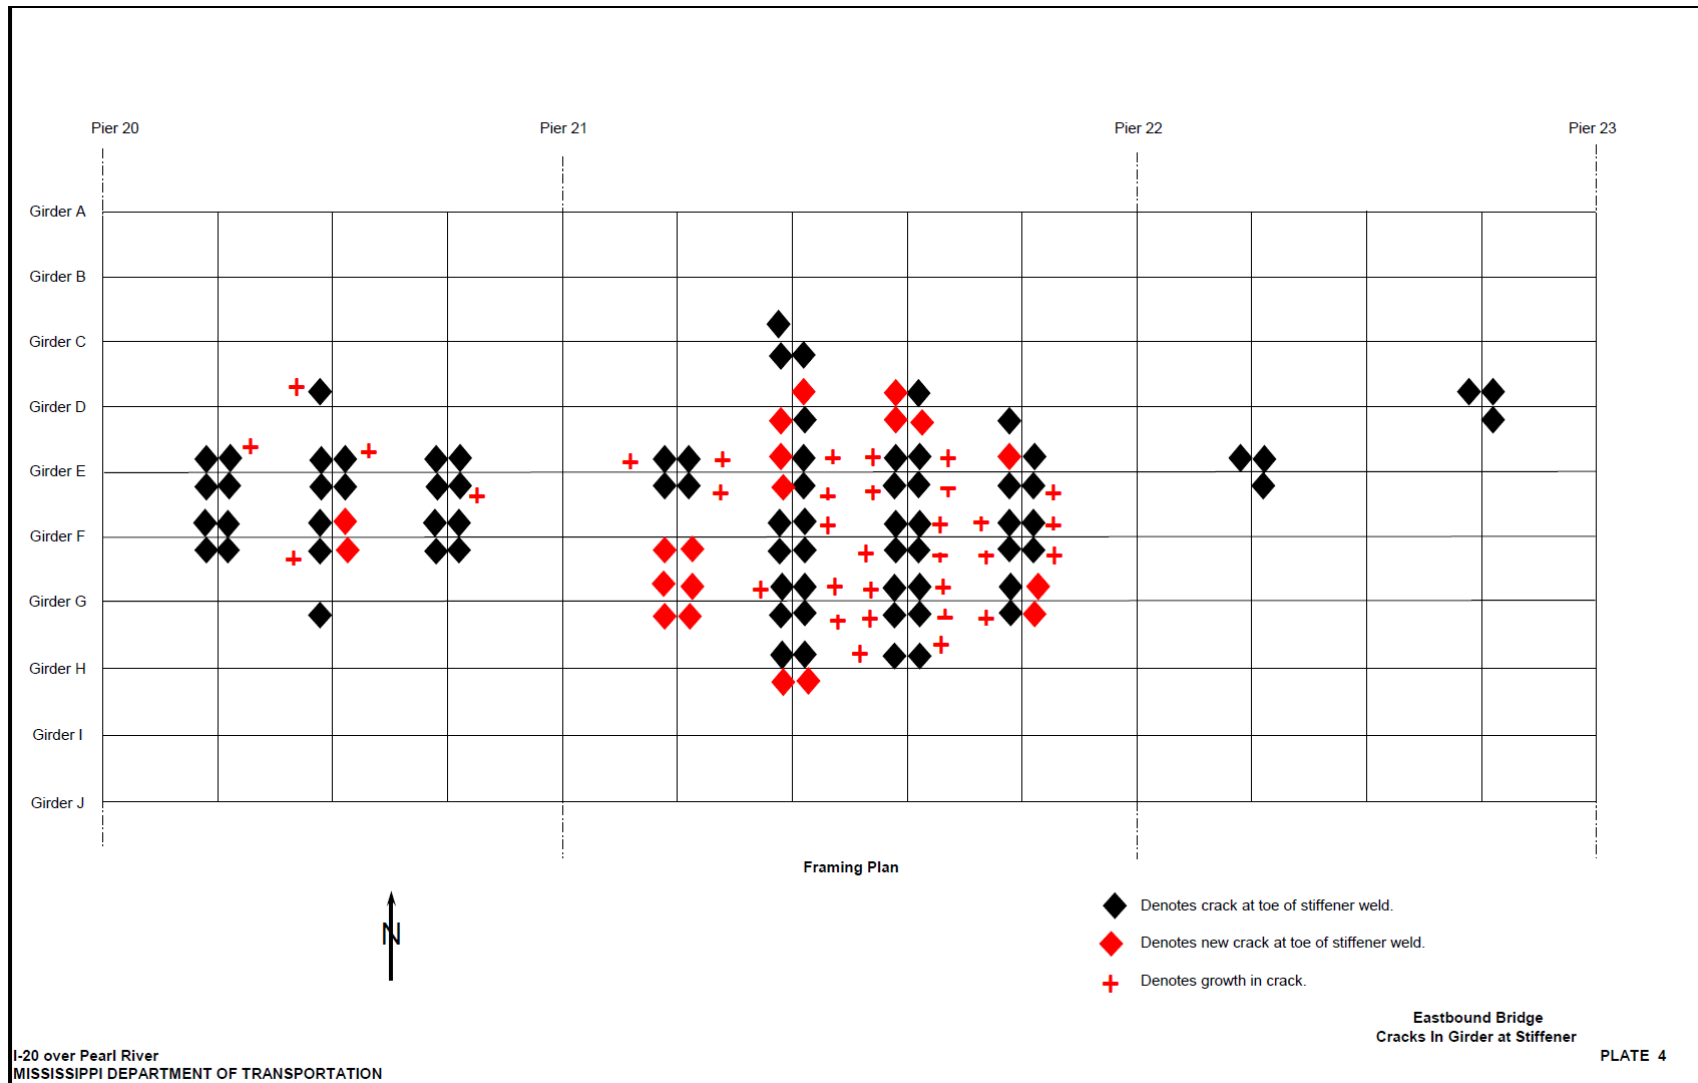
Eastbound Bridge Cracks in Girders at Stiffeners
